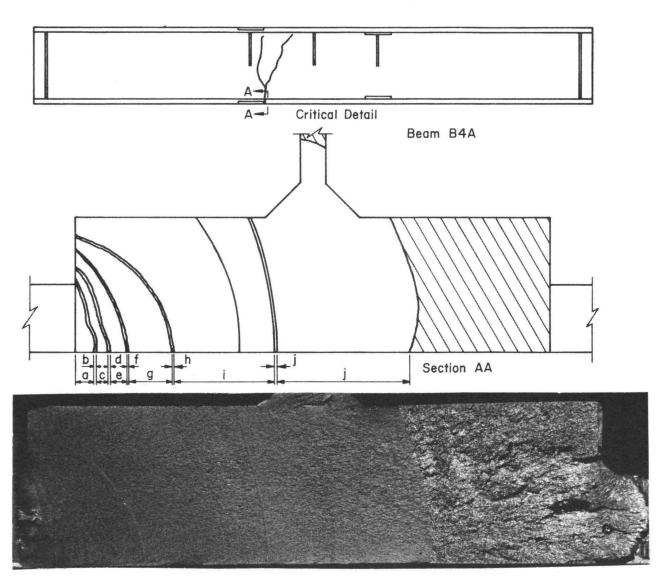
Fatigue and Fracture Surface, B4A (A36)
